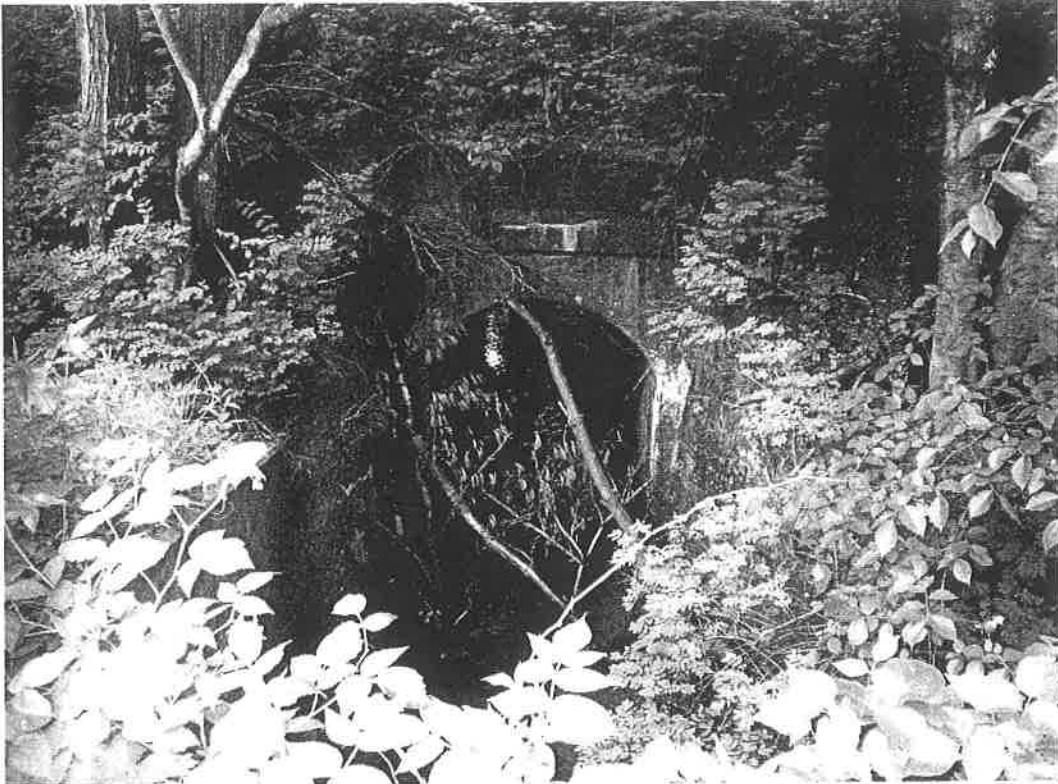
Looking from Webster Street through the existing box culvert under the trolley right-of-way.
